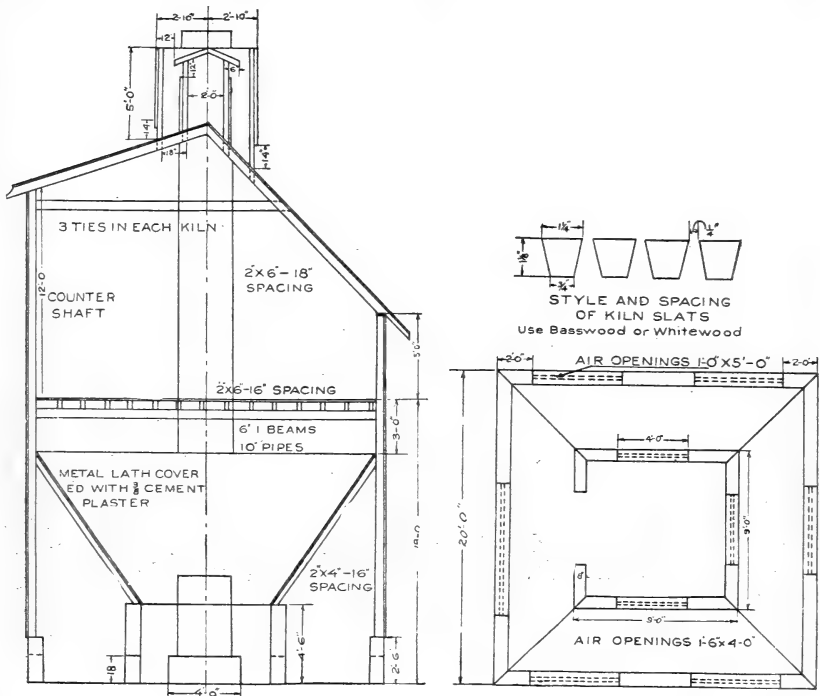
Cross section and ground plan of a kiln. When the kilns are built in rows the furnace rooms are not separated, but the furnaces have separate inclosures and hoppers for distributing the heat. The drying floors are separated by walls.
